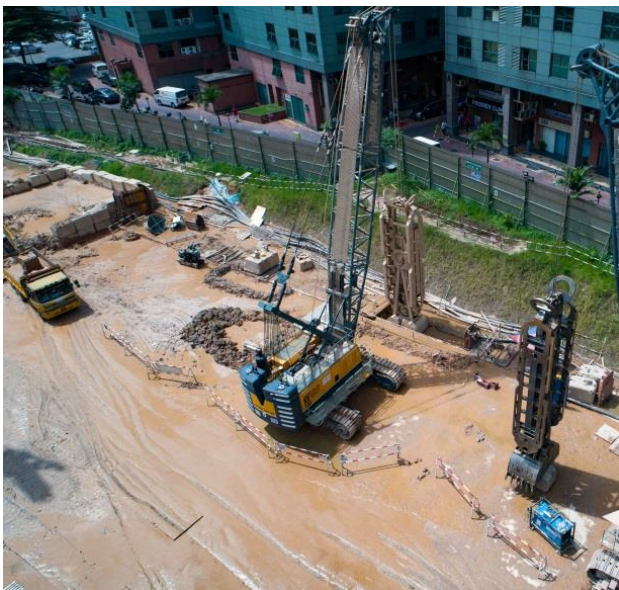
Diaphragm wall construction adjacent to building (featured in Ground Engineering 2018)
